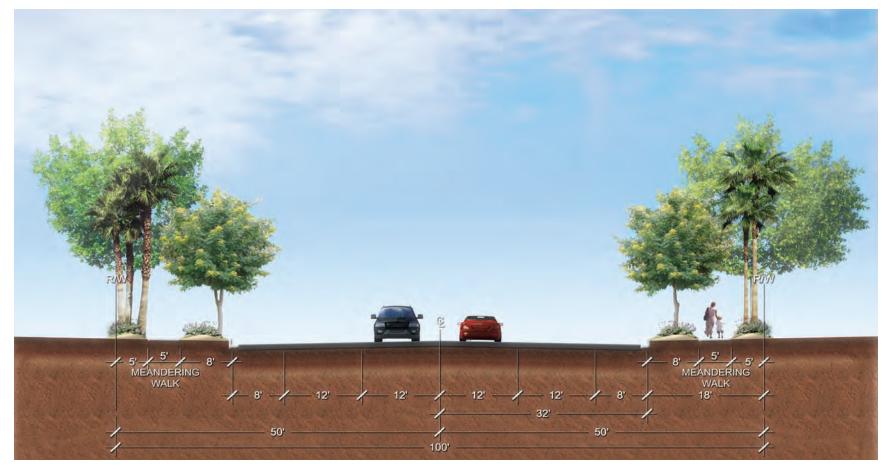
| Themed Road(s) - A Section (100' R.O.W.)
